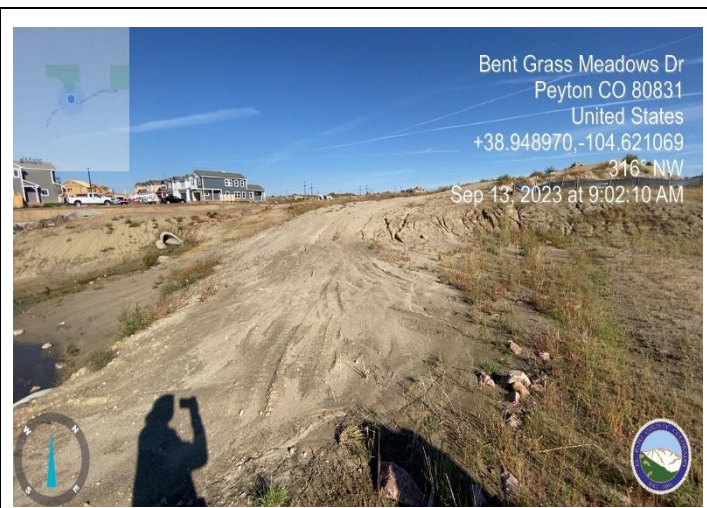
The grade of the north side of the spillway has been raised due to an adjacent temporary access road. This appears to be causing the erosion at cutoff wall. Regrade north side of spillway per plan.
